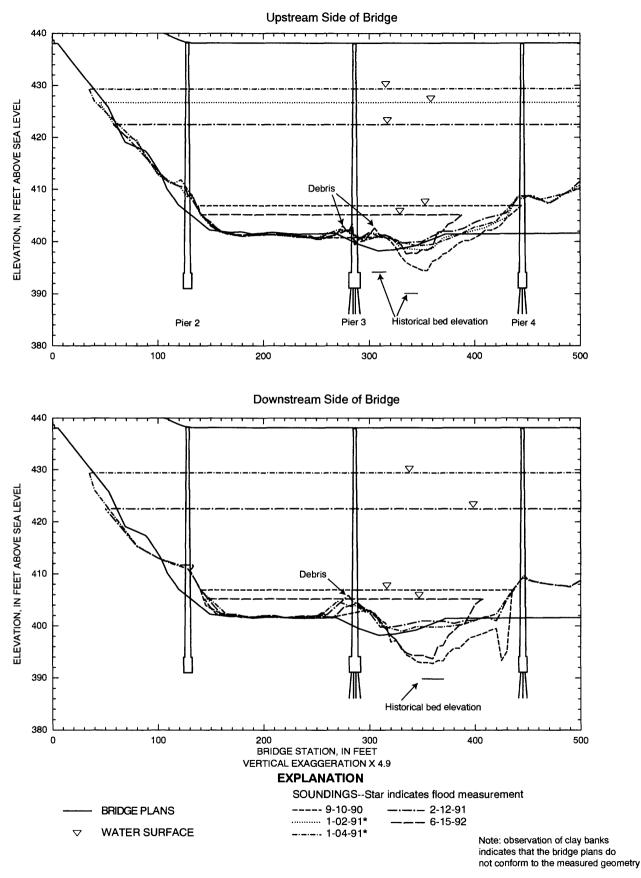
Cross sections showing bed elevations from bridge plans and soundings, State Road 57 over East Fork White River near Petersburg, Indiana.
